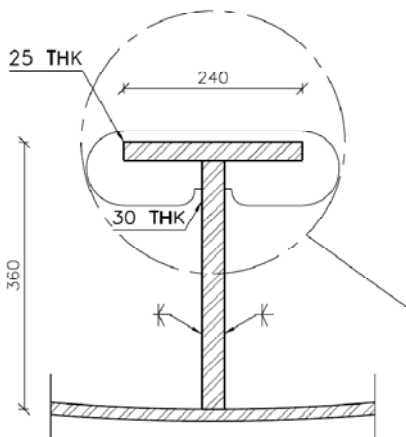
T-stiffener add as backing in the roadway girder, cross over location only
